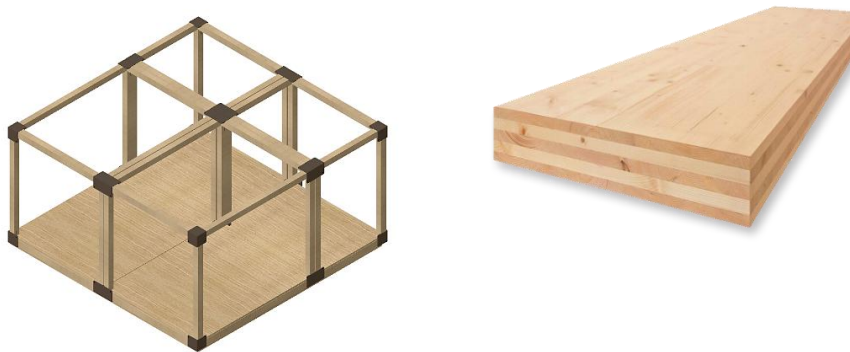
CLT Floor Installation: Panel Placement and Alignment (by the author)
